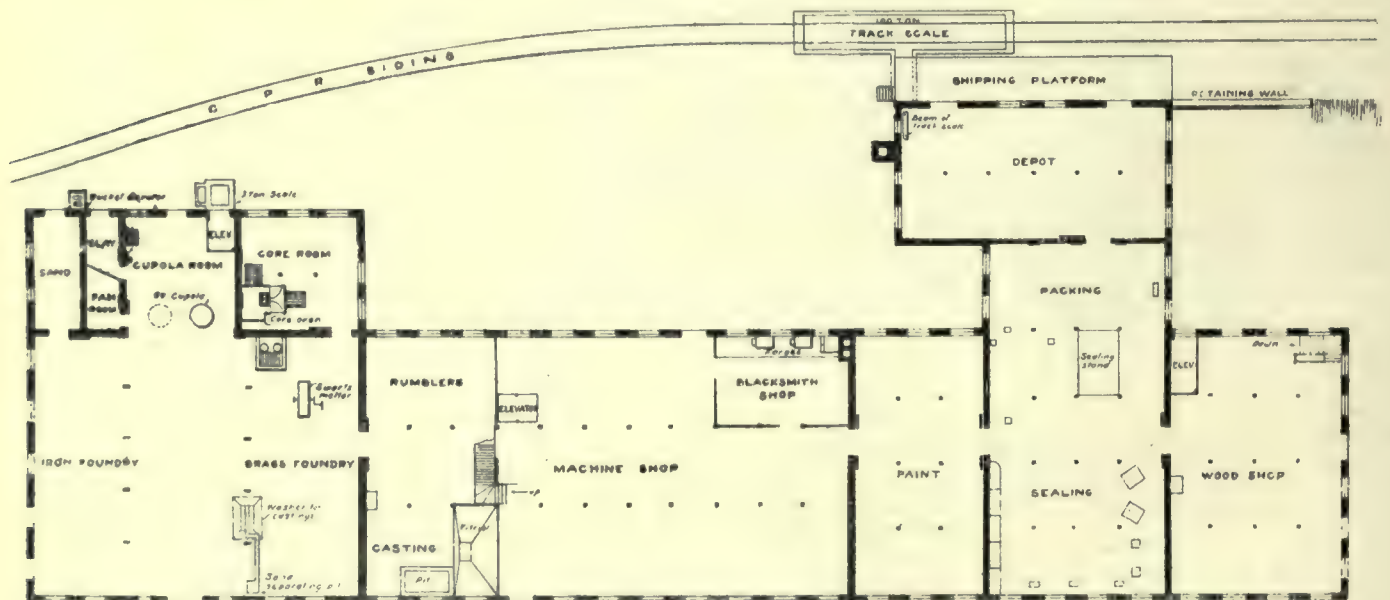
Ground Floor Plan E. & T. Fairbanks Plant, Sherbrooke.
